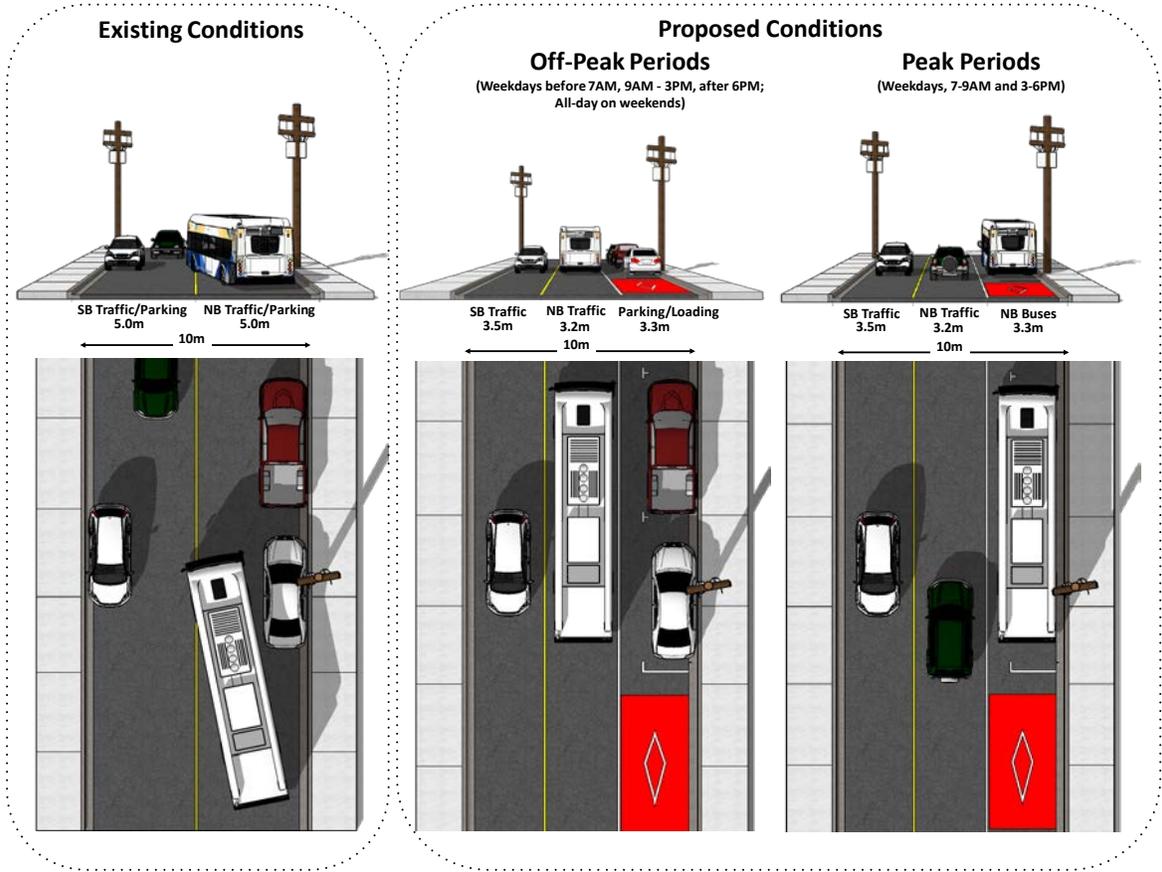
Existing and proposed typical cross section (looking to the north) - Gottingen Street
